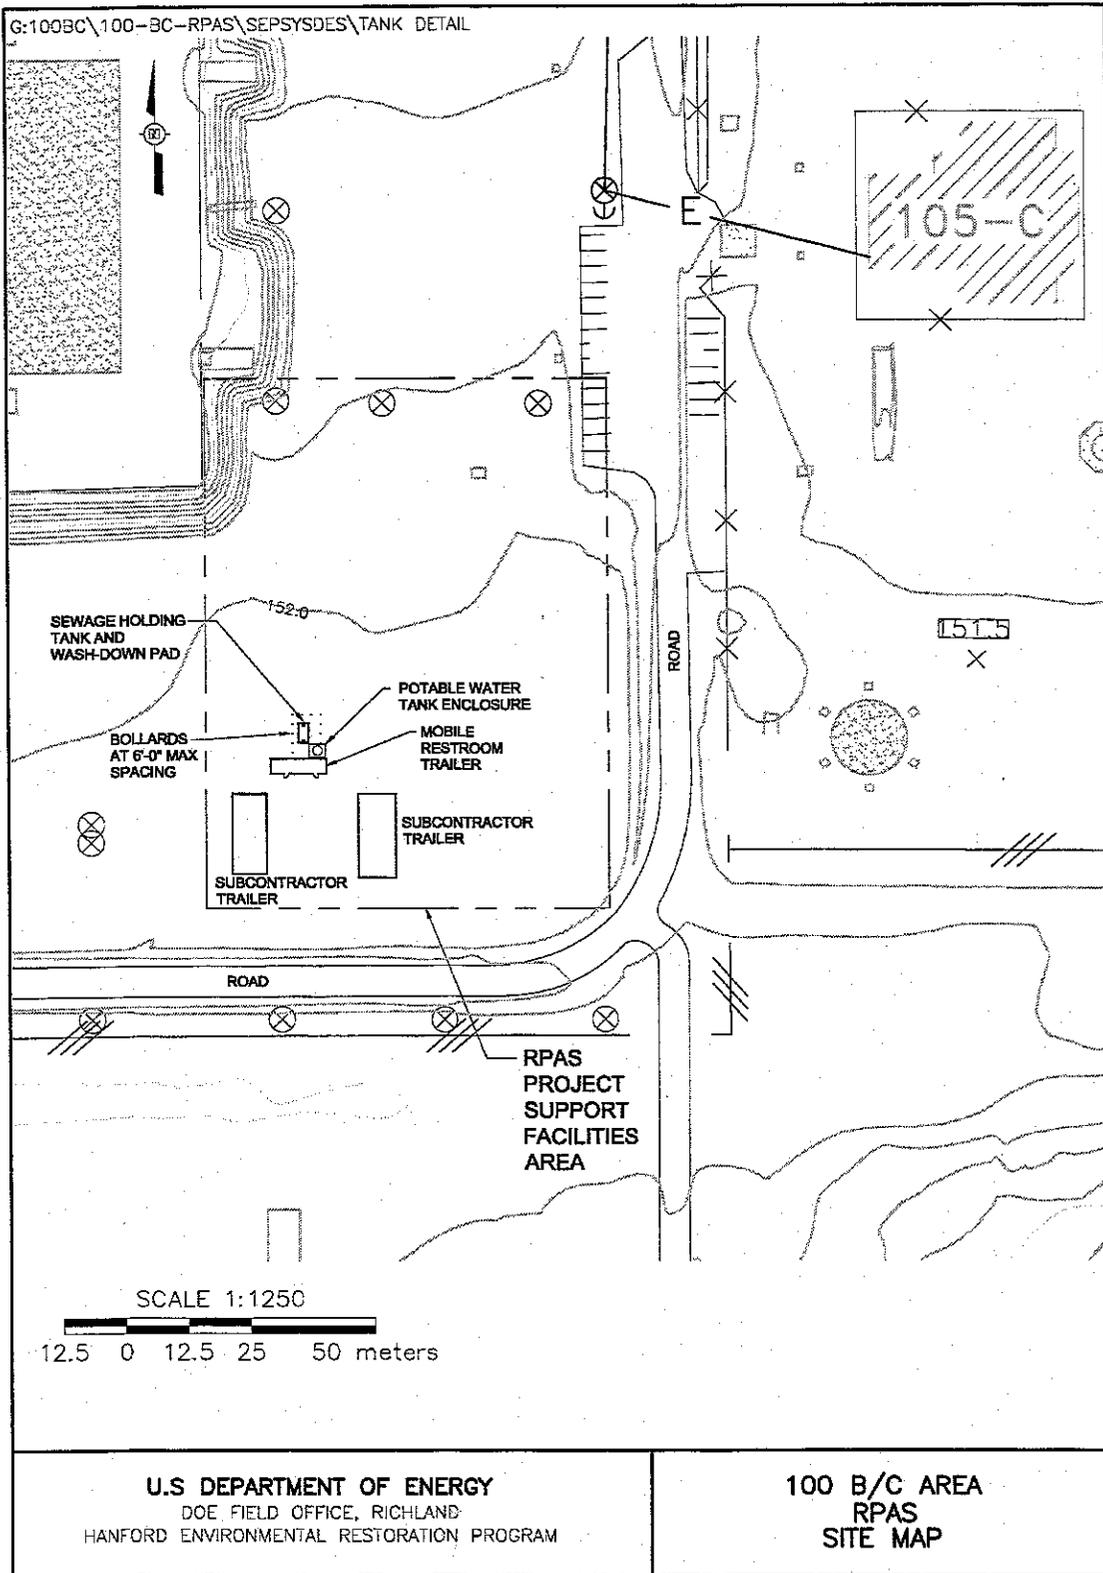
100-B/C Area Remaining Pipelines and Sewers – Septic Tank Section.
